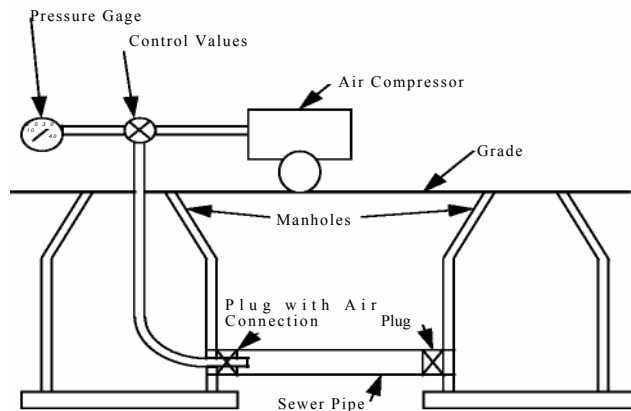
TYPICAL AIR TEST EQUIPMENT LAYOUT
